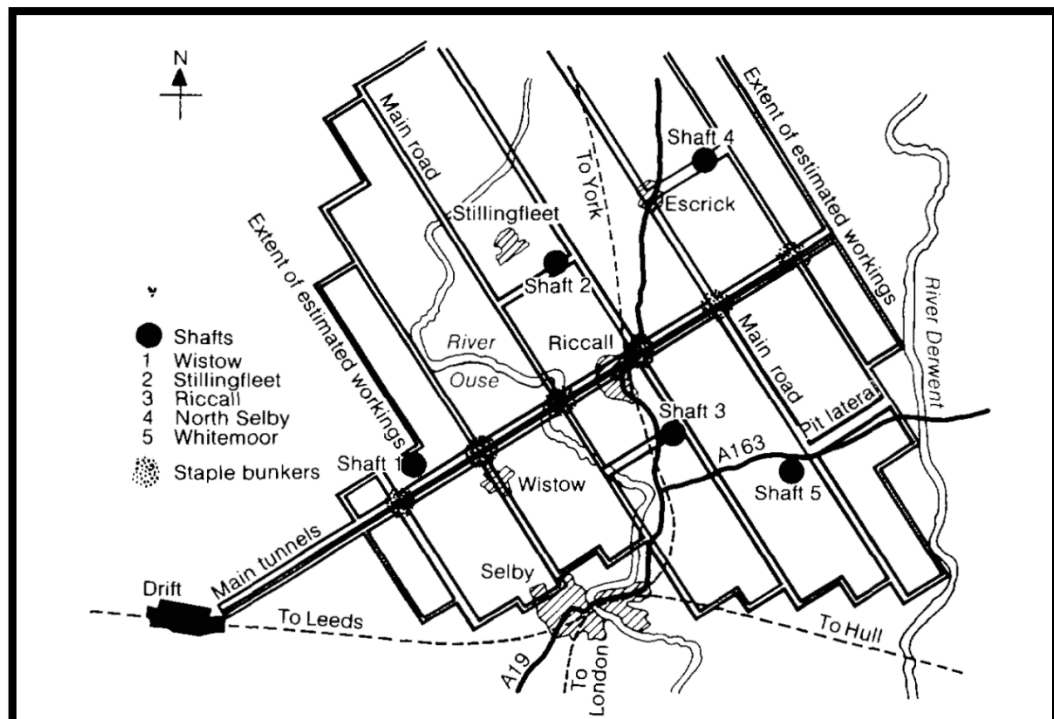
The plan of Selby underground coal mine (Forrest et al., 1983).
